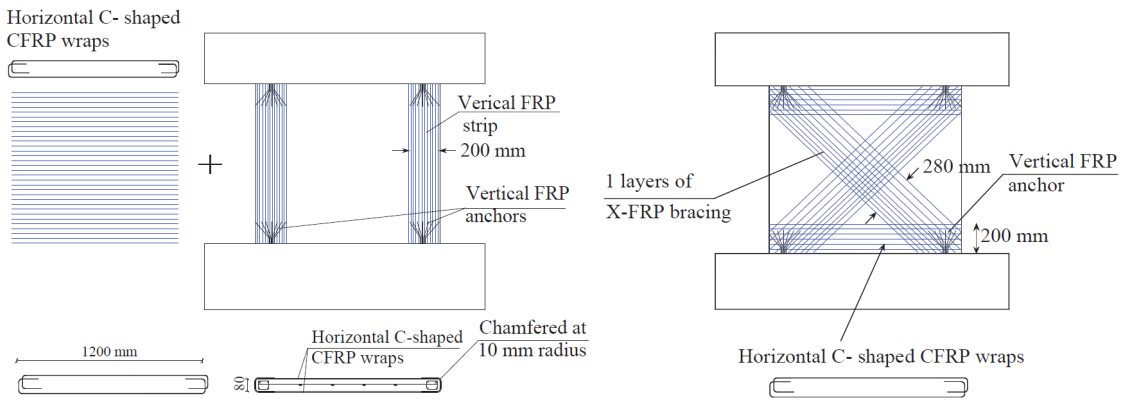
Retrofitting schemes for the wall panels tested by El-Sokkary and Galal (2013)
